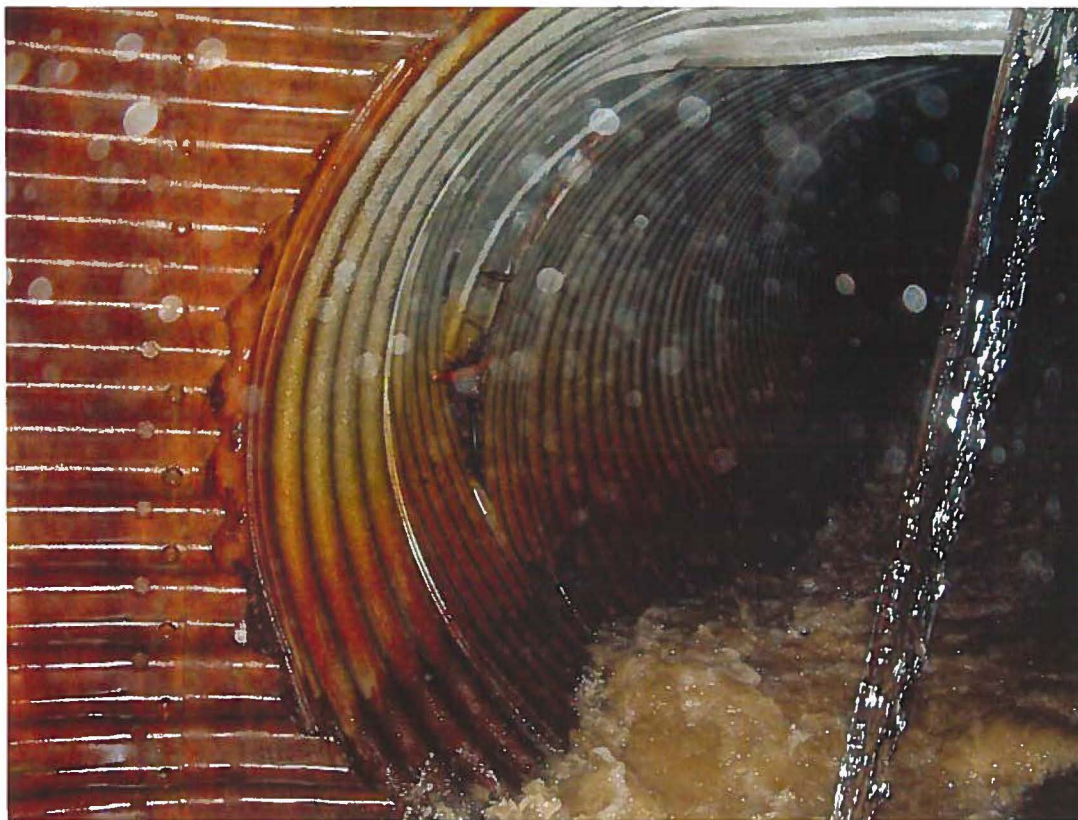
View of joint separation in 2000mm Ø culvert taken from inside of 3000mm Ø drop structure
